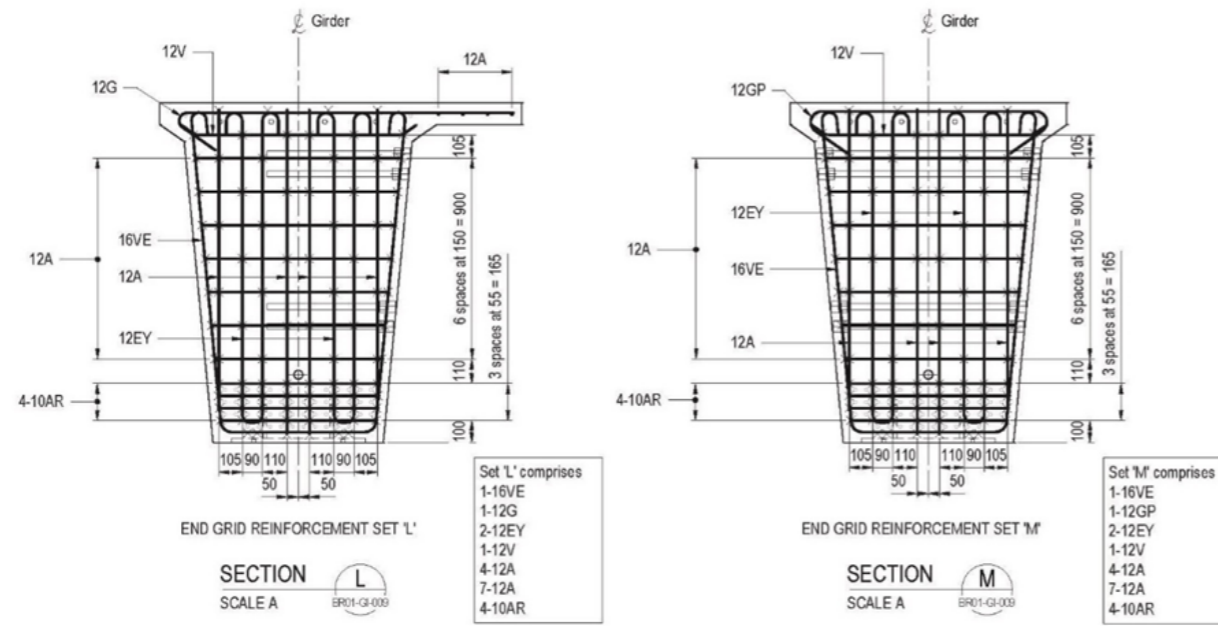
(I) - Example Super-T girder bridge drawings - Sheet 12
